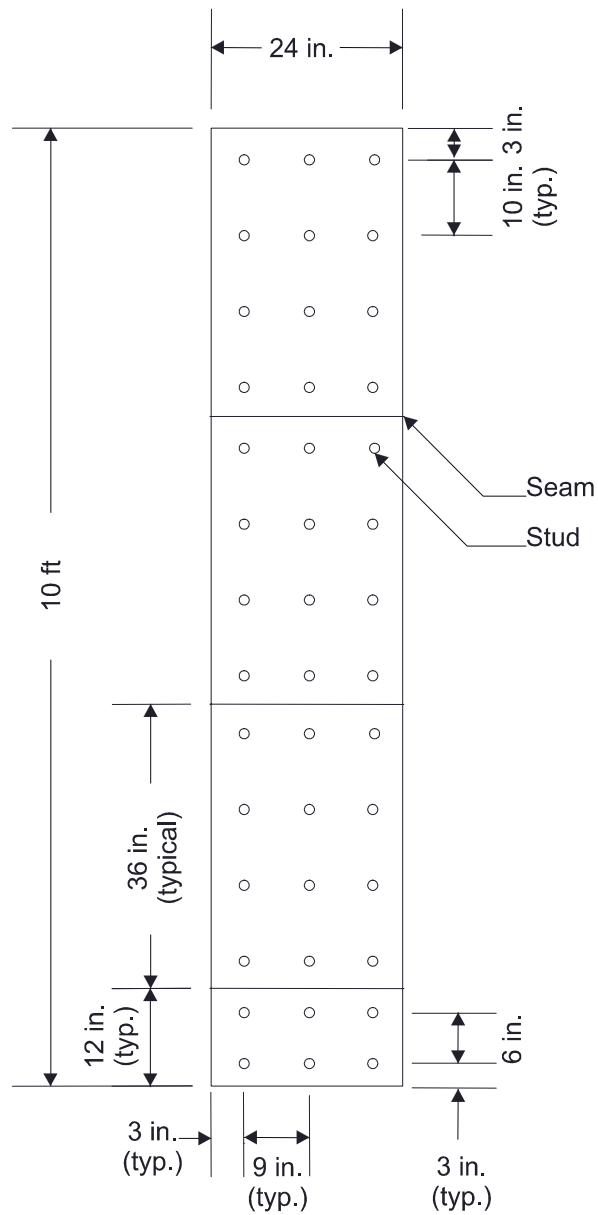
Insulation layout - stud location and seams between stiffeners (typical frame bay panel - plan).
